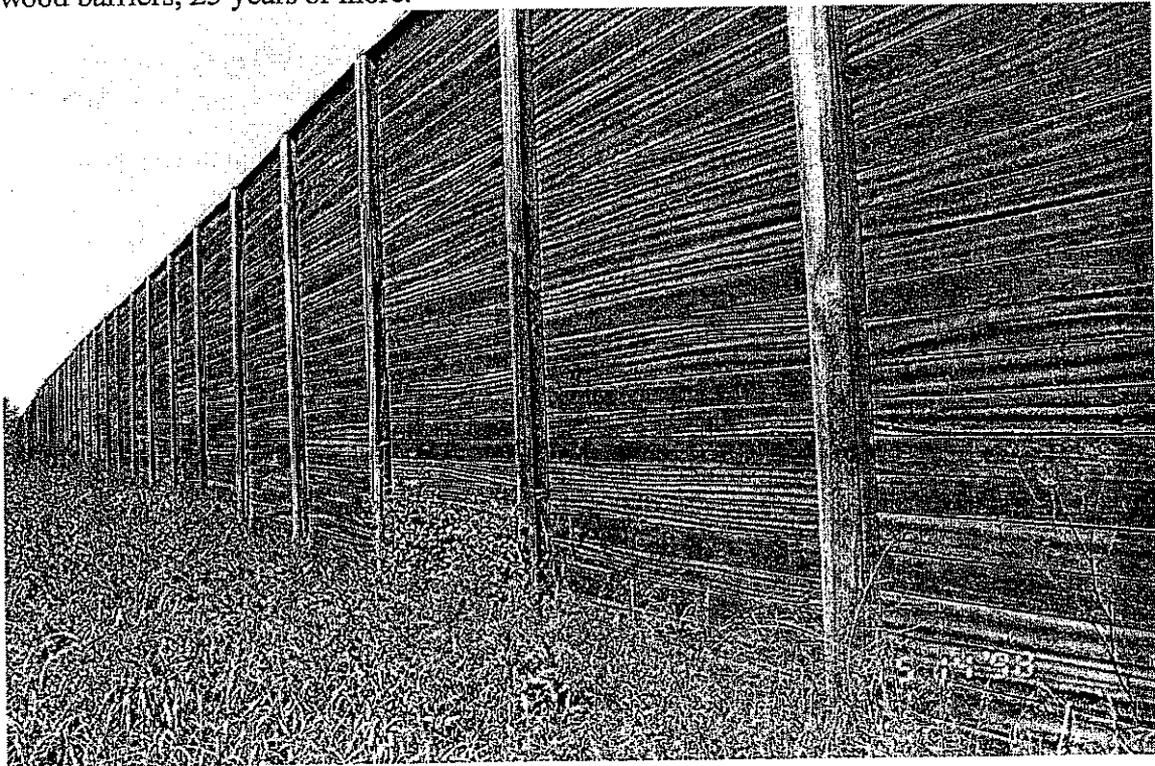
Tropical hardwood barrier IL 53 near Army Trail Road.
